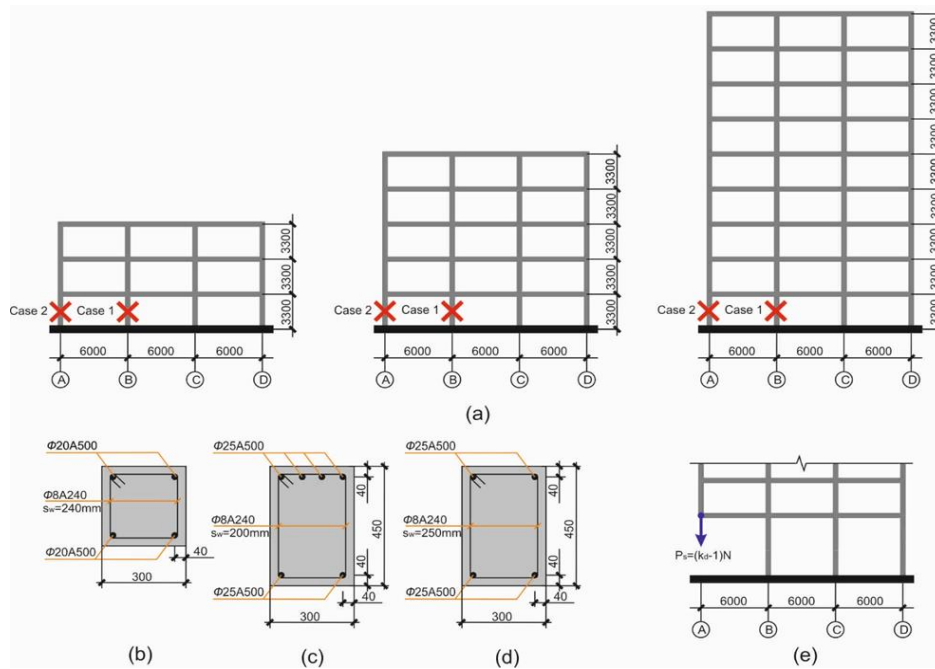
Reinforced concrete frames (a); cross-section and reinforcement scheme of columns (b); cross-section and reinforcement scheme of beams near columns (c); cross-section and reinforcement scheme of beams at mid-span (d); accidental impact (e)
